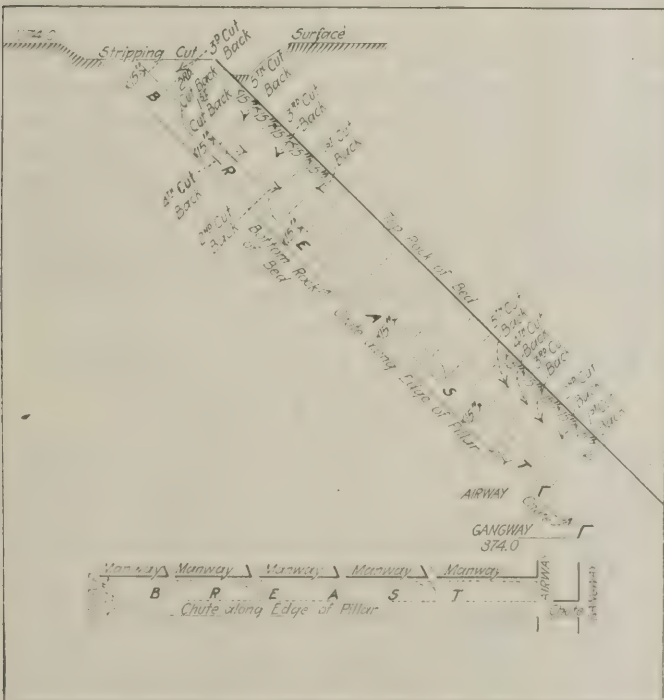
PLAN OF MINING FOLLOWED NEAR THE EDGE OF A BARRIER PILLAR
